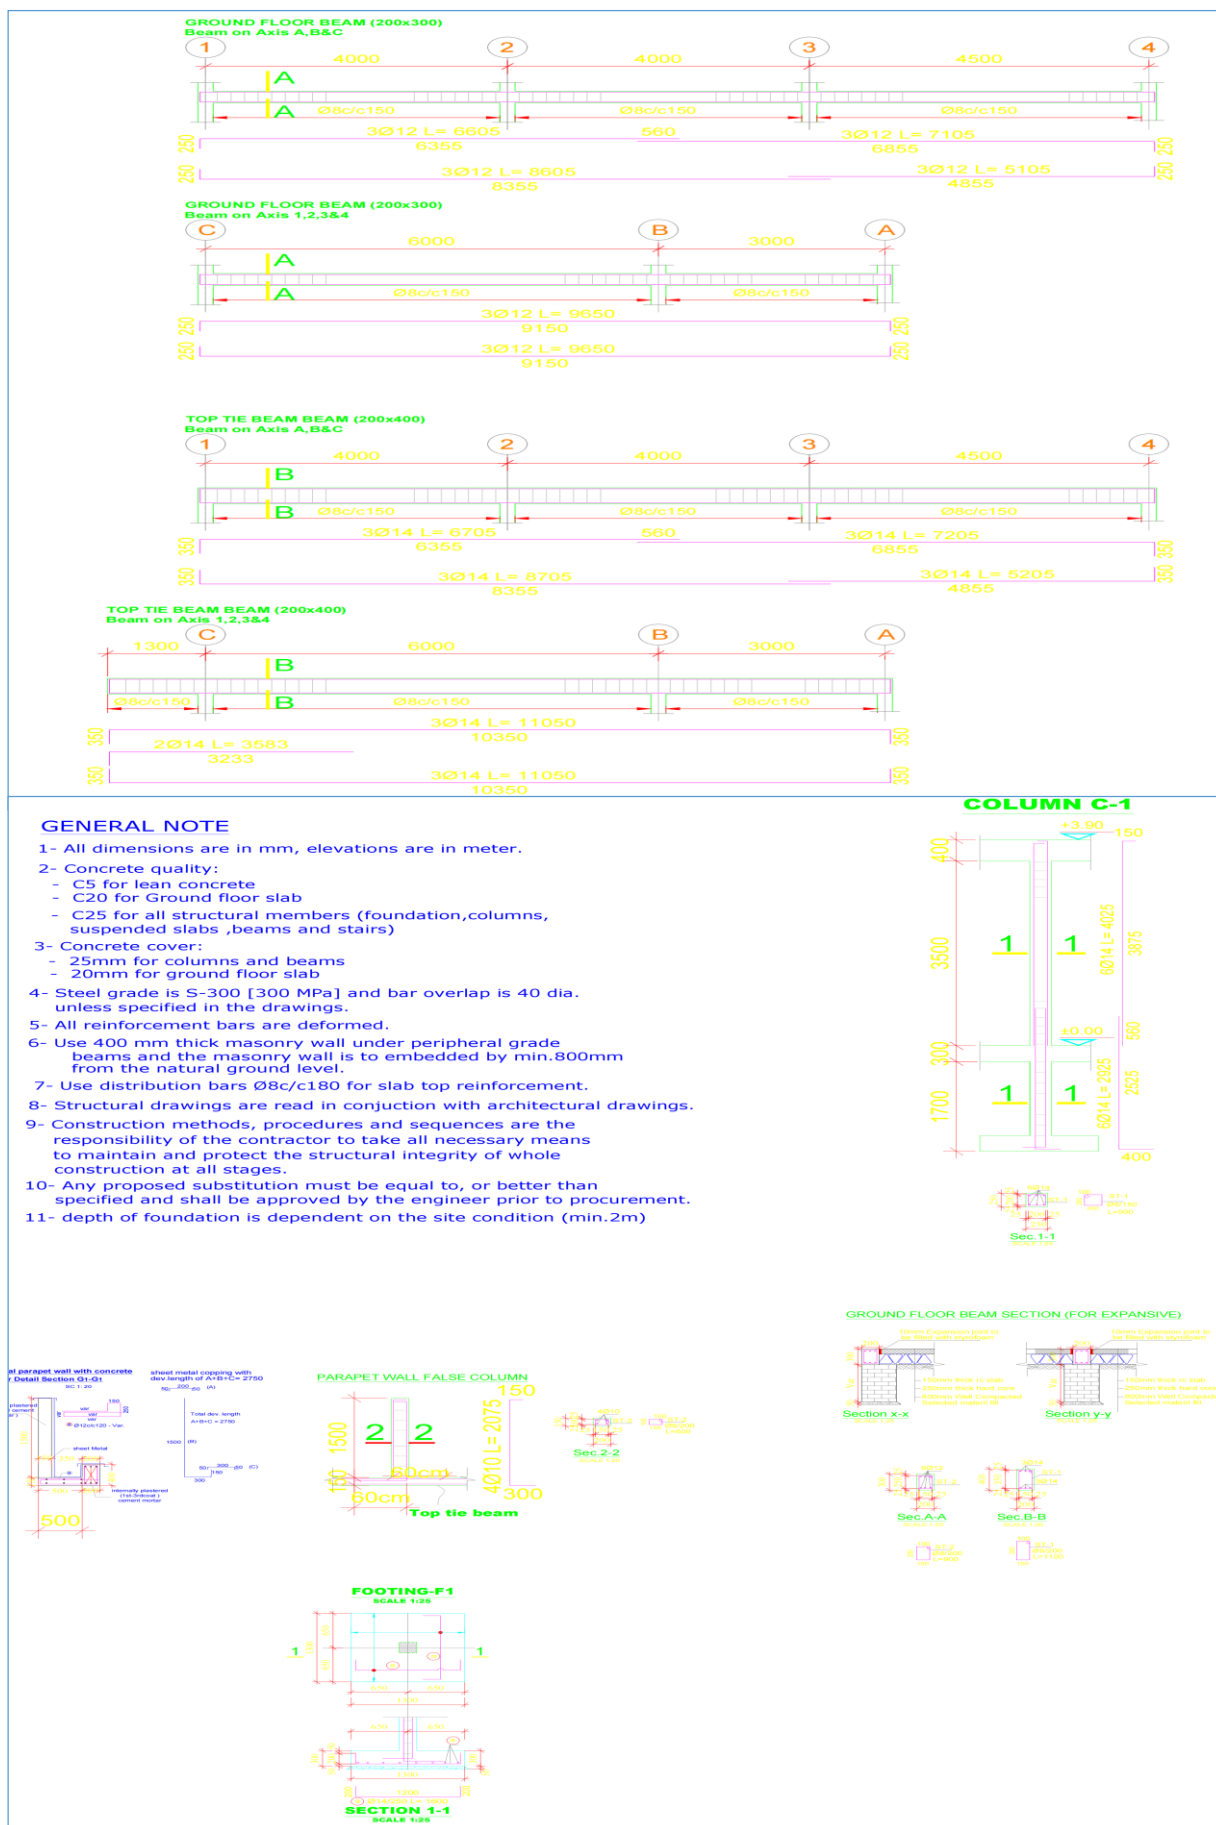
Footings & Beams Rebar Details and General Structural Notes of Community Pharmacy.
